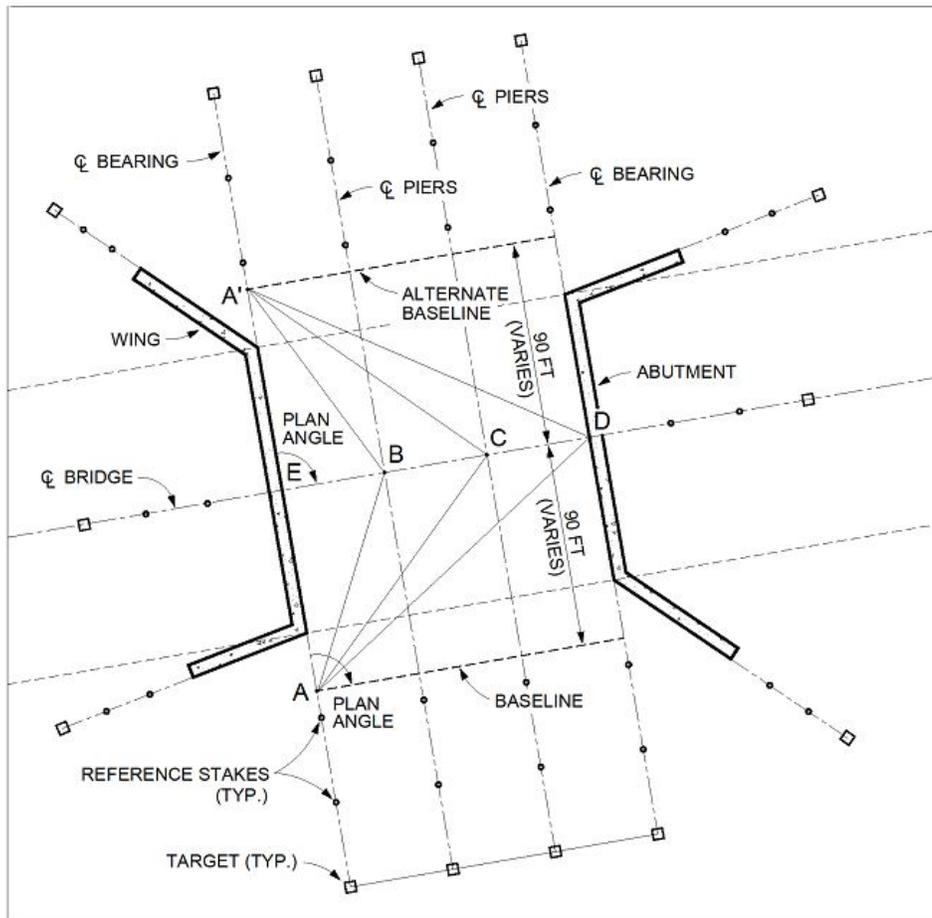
5: Typical Multi-Span Bridge Layout (Dry)
